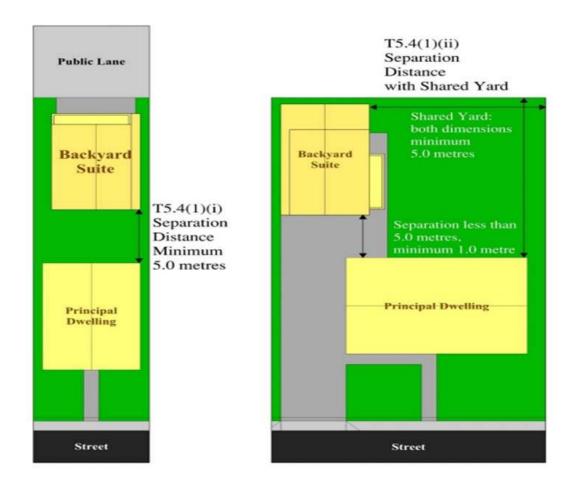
A.F2A: Setback from Primary Building for Dwelling, Backyard Suite (#2022-41, s. 12, 2022)
